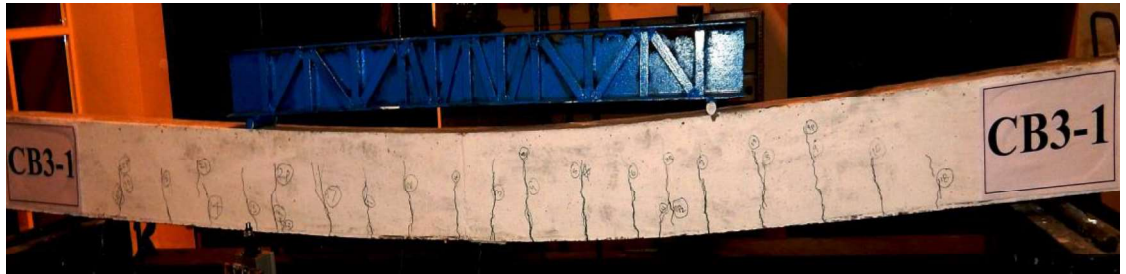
2 Crack patterns of beam CB3-1 when total failure of specimen occurred.
